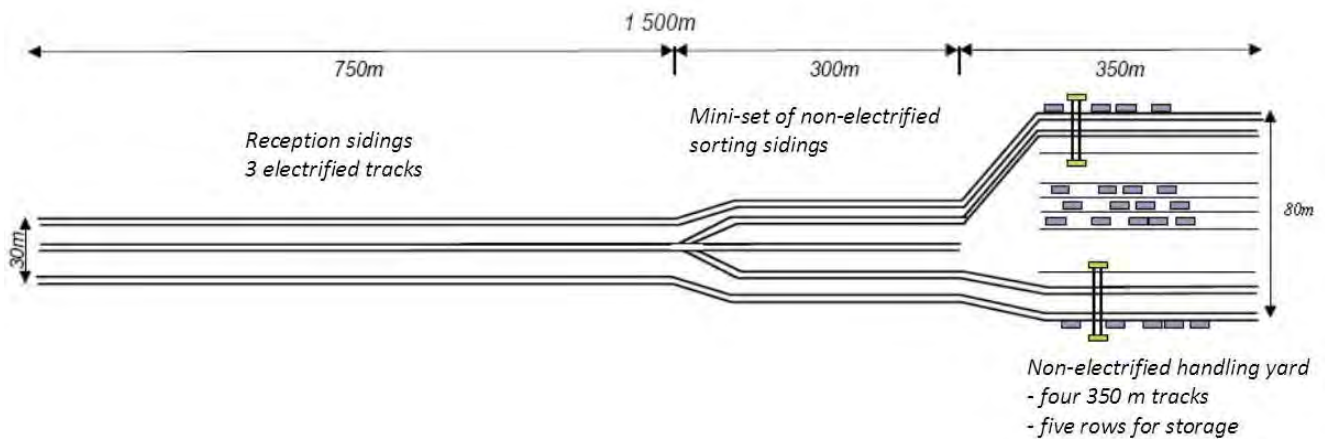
Longitudinal view of Bayonne intermodal road/rail terminal
